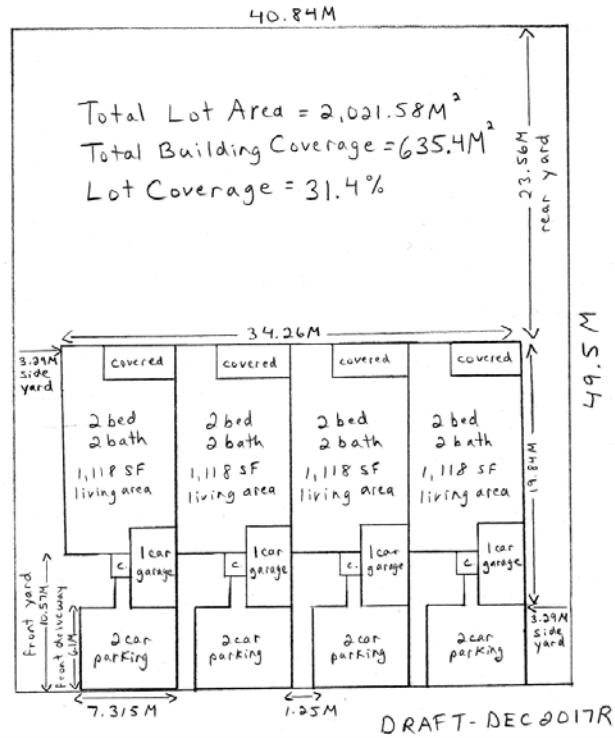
Proposed Lot Layout - Lots 1, 3, 5, 7
